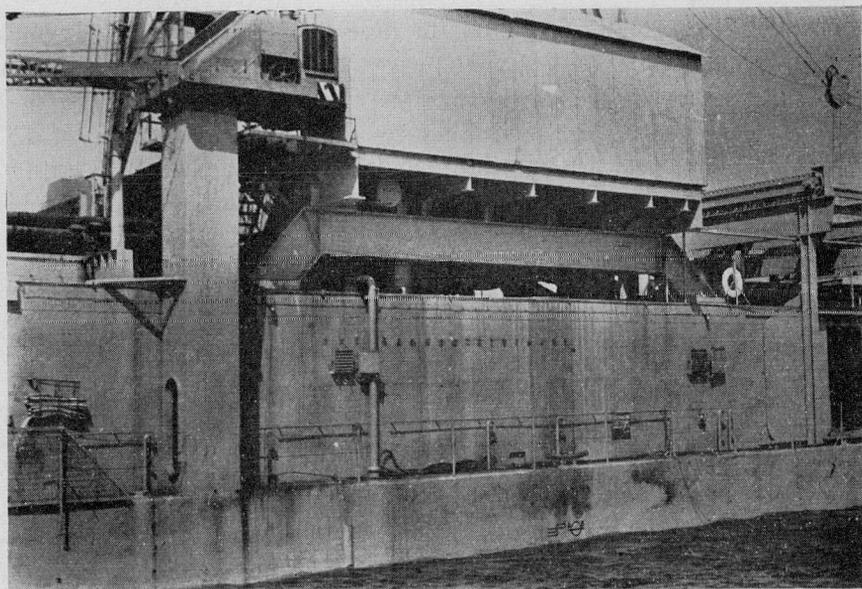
STRUCTURE SUPPORTING DRILLING DECK.
